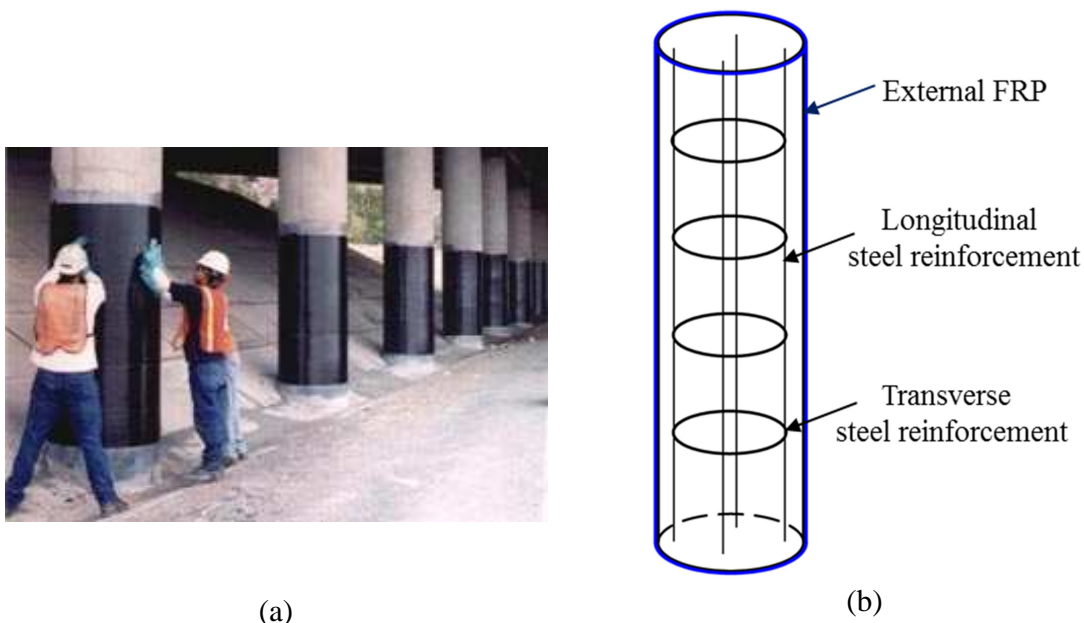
FRP-confined RC members: (a) bridge piers confined with externally bonded FRP sheets (<http://www.luckett-farley.com/frp-strengthening/>), and (b) sketch of a RC column confined with external FRP
